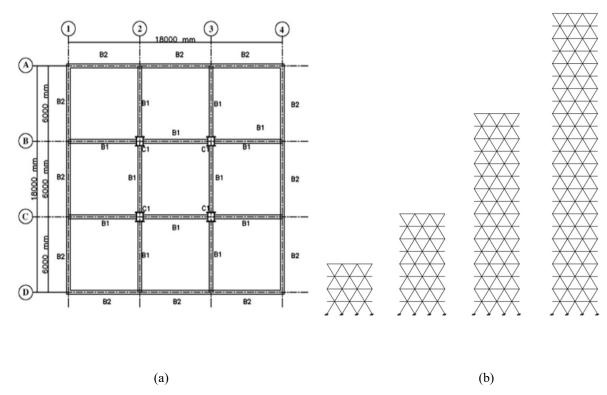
(a) Typical plan of CFST diagrid building (b) Elevation of 4, 8, 16, 24 storey CFST diagrid building
